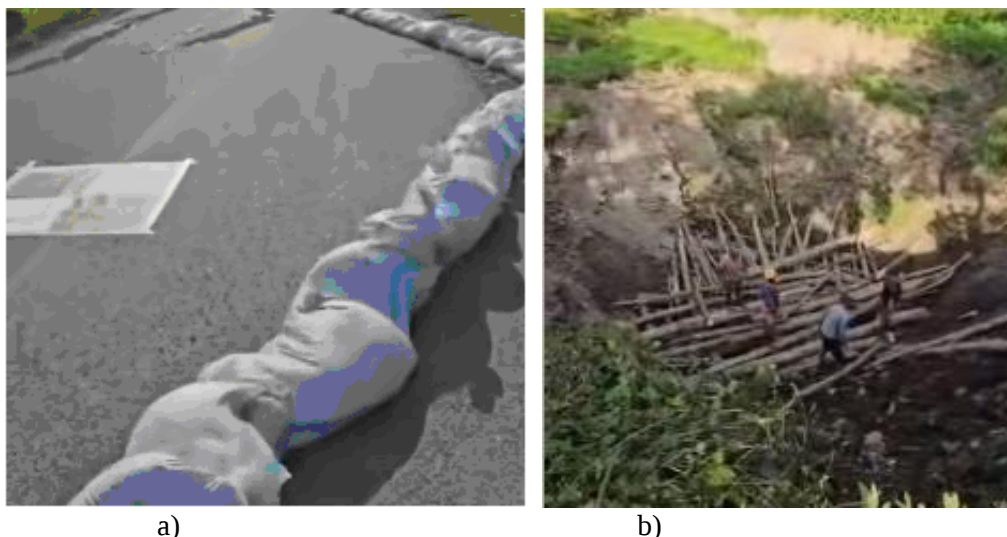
Images of the in-situ situation, after the collapse phenomenon occurred a) temporary drainage of water and filling of fractures in the asphalt of the road b) reinforcement of the collapse cone with wooden logs
